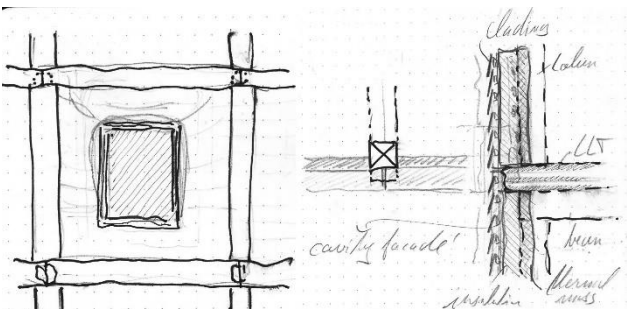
modern reinterpretation of a timber-earth hybrid construction with a possible cladding against erosion.
